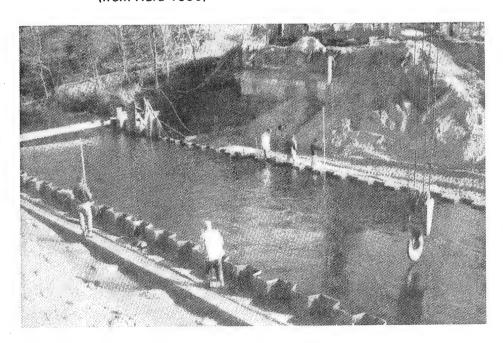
Cast-in-place footing with shims installed for Kent County bridge construction (from Hurd 1990)
